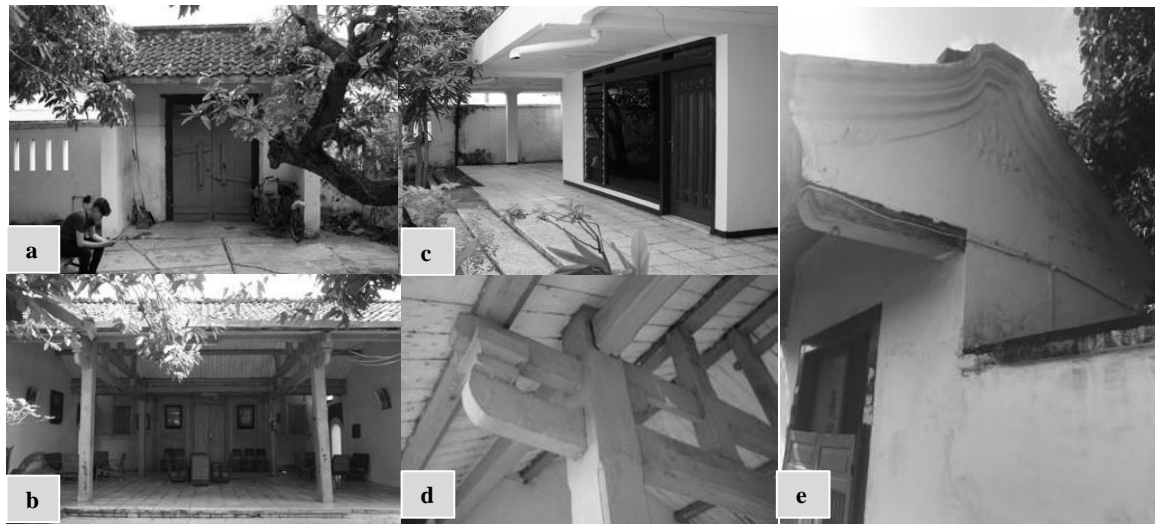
The Chinese architectural features: (a) the main gate with the gable wall, (b) the verandah with wood frame structure, (c) the addition of new building for residence, (d) *Dou gong* wood construction system at the verandah, and (e) the gable wall of the main gate
